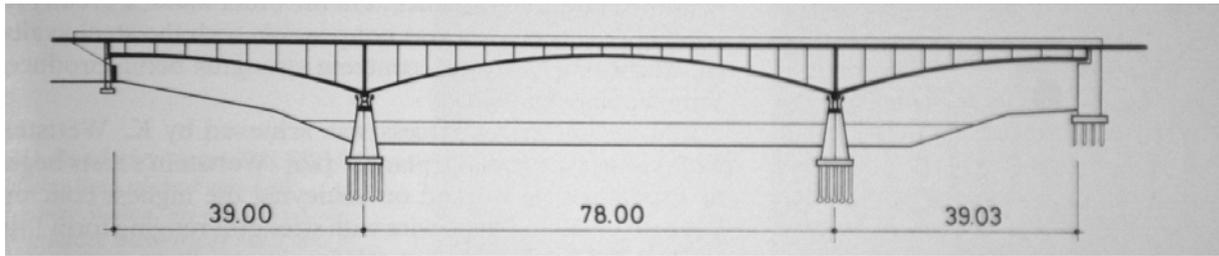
The Villeneuve-St. George over the Seine near Paris, the longest reinforced concrete beam bridge in the world with a span of 78 m, 1939. (Wittfoht)
